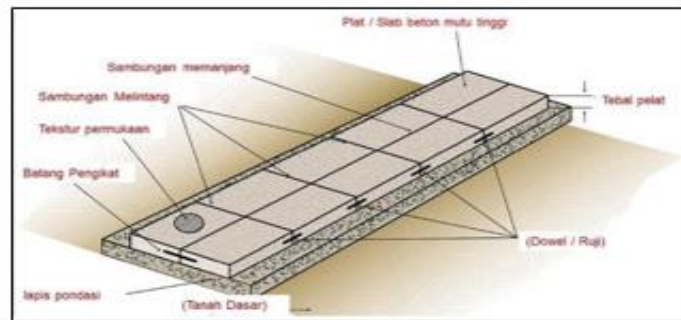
Types and Locations of Rigid Pavement Reinforcement
